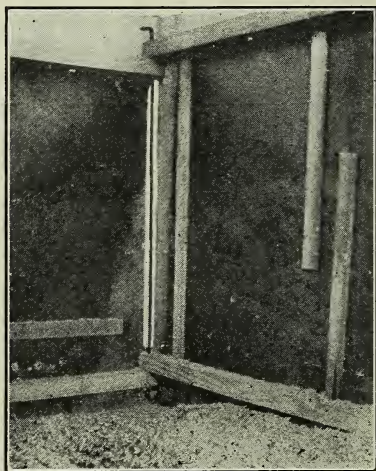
Corner construction. Note that the 2x2 inch pieces on the side overlap those on the end and are fastened by an iron rod which passes thru all four pieces.
